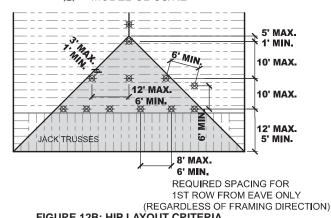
B: HIP LAYOUT CRITERIA WHEN FIRST ROW OF SPRINKLERS PLACED BEYOND JACK TRUSSES
